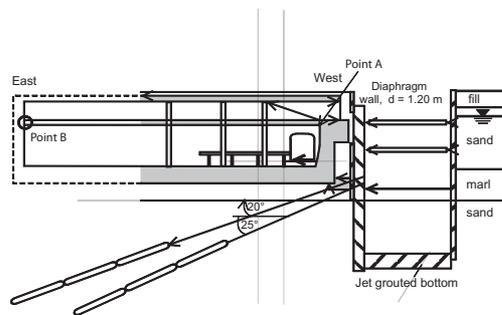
Cross section of city railway station and excavation wall at Potsdamer Platz in Berlin.
